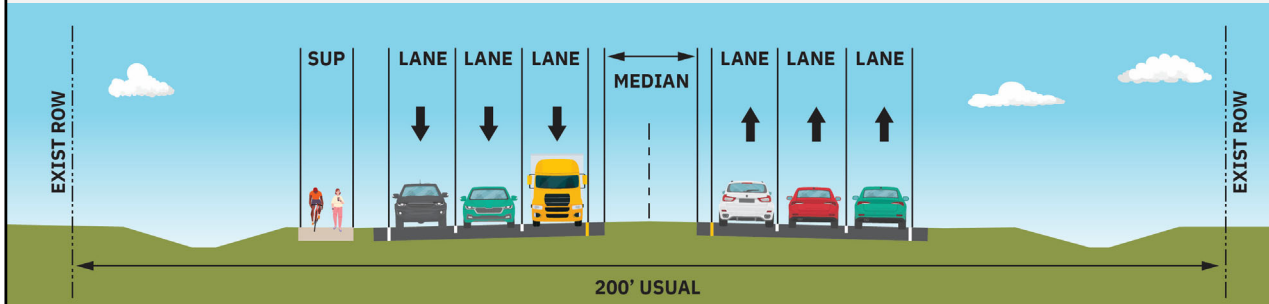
FM 156 proposed typical section from Intermodal Parkway to Texan Drive, showing six 12-foot wide travel lanes, a center median, 2-foot offset, and a 10-foot wide shared-use path on the southbound side of the facility. The proposed usual right of way width is 200 feet.
